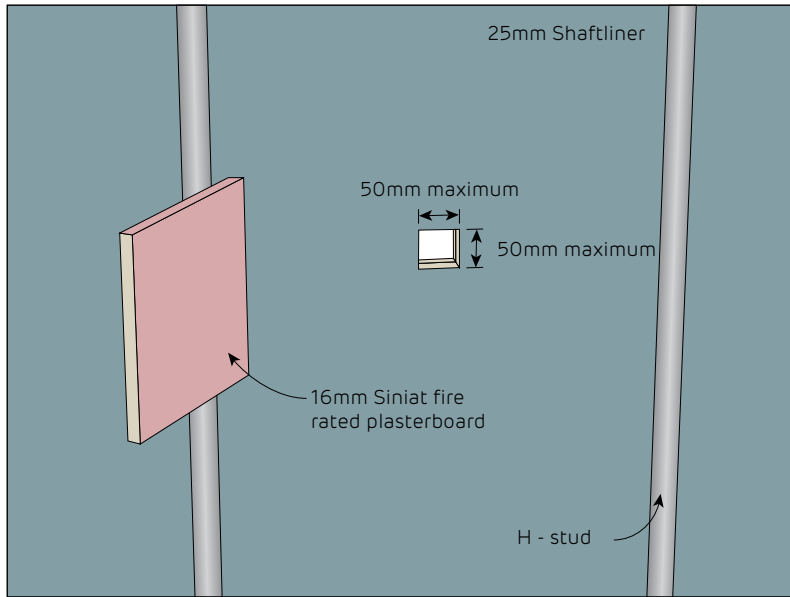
Plumbing and Electrical Penetrations in Wall Linings
